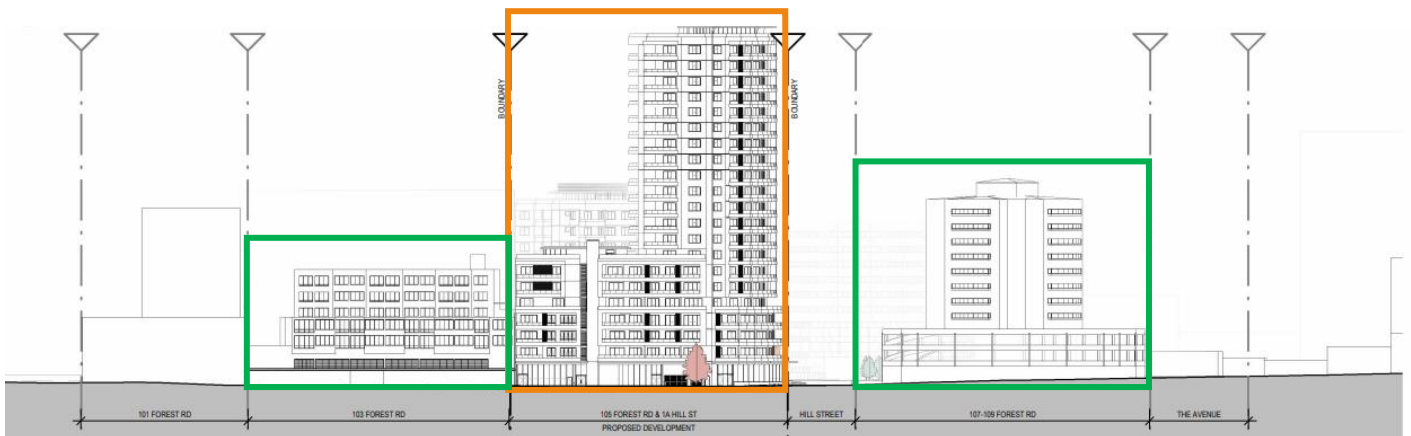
Street elevation along Forest Road – Proposed development (highlighted orange) with the adjacent shop top housing at 103 Forest Road and 107-109 Forest Road (highlighted green) (Source: DWA, 2025)
